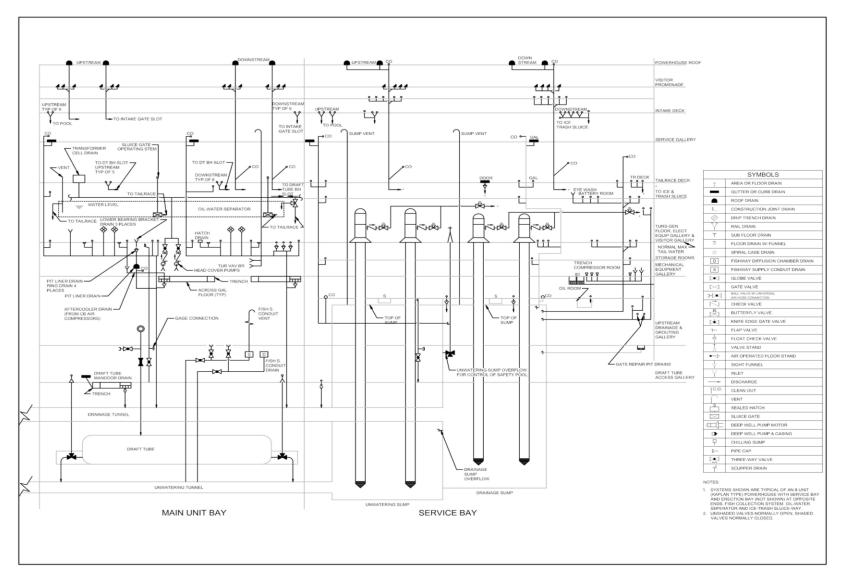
Example unwatering and drainage system for a typical large plant with multiple Kaplan units
